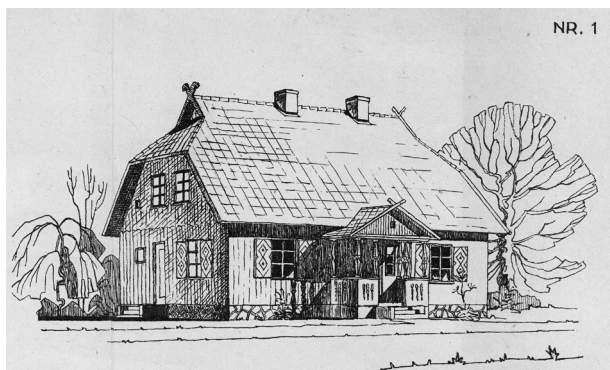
Project of a standard homestead house, variant for wooden construction (civ. eng. Viačeslavs Daugėla, 1942)
